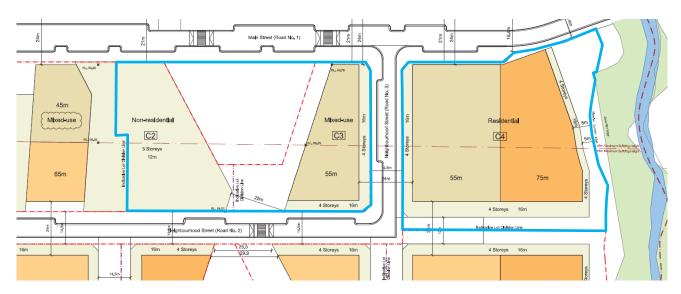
Extract of stamped plan showing the approved height of the building envelopes for C2, C3 and C4 with the Stage 2 areas (outlined in blue)
